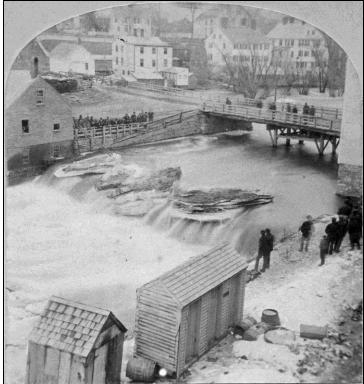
Photo of String Bridge, before 1888 reconstruction, downstream side and west channel. Note west span consists of stringers carried on two pile bents (actually 3-spans) and east span is a wood pony truss. Also note outhouses in foreground and crowd on Kimball's Island attempting to dislodge grounded ice cake at edge of falls with a ladder (Exeter Historical Society).
